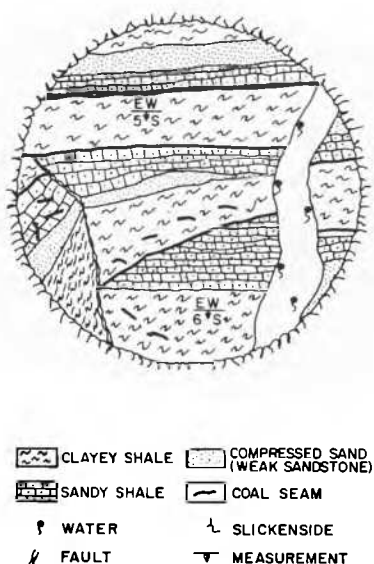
Geological section of tunnel to be excavated through soils having a great swelling tendency.
